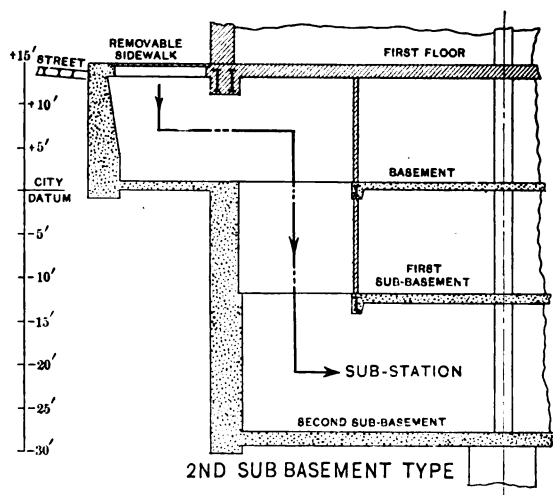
SECTIONAL ELEVATION, SECOND SUB-BASEMENT TYPE
